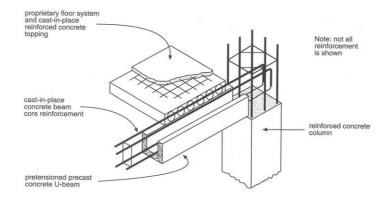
Precast, pre-tensioned beam shell [Centre for Advanced Engineering, 1999]
